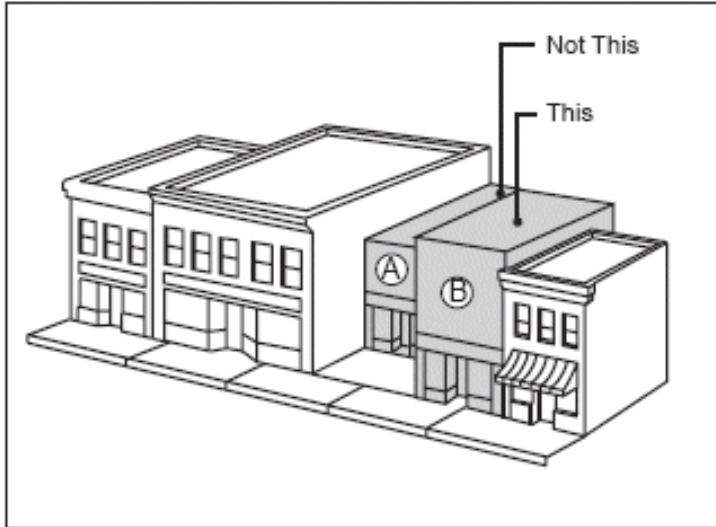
shows the desired placement of new buildings along the street to maintain continuity along the street edge. Building A creates a gap or break while Building B reinforces the edge along the public sidewalk.
